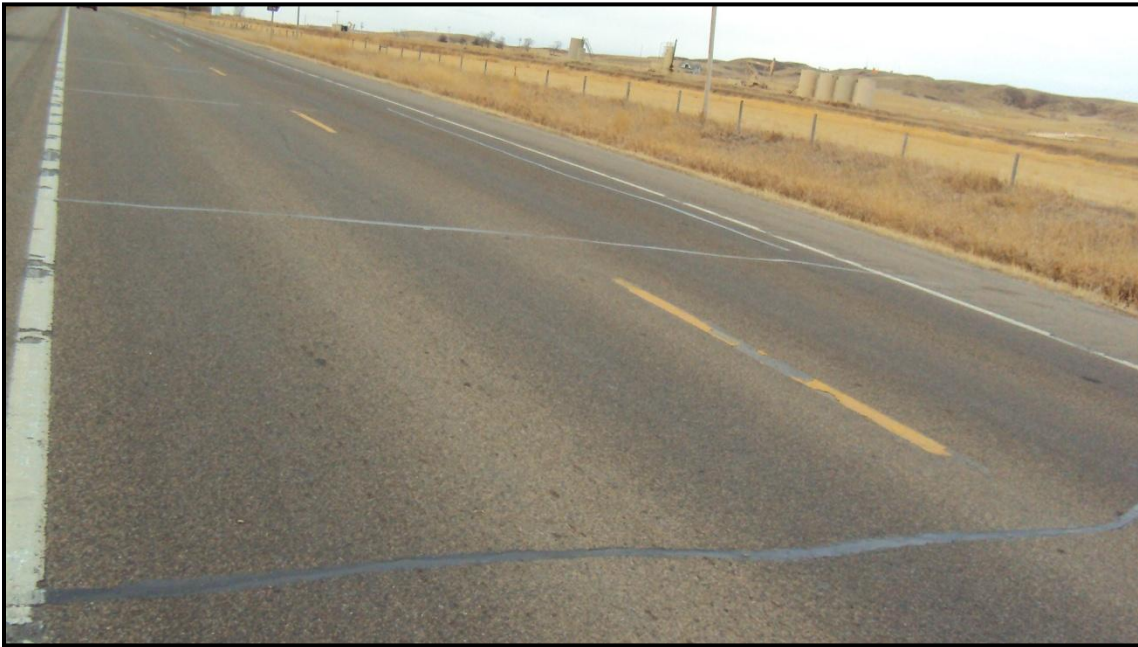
Looking north on MT 200 at transverse and longitudinal pavement crack sealing. RP 56.0.
